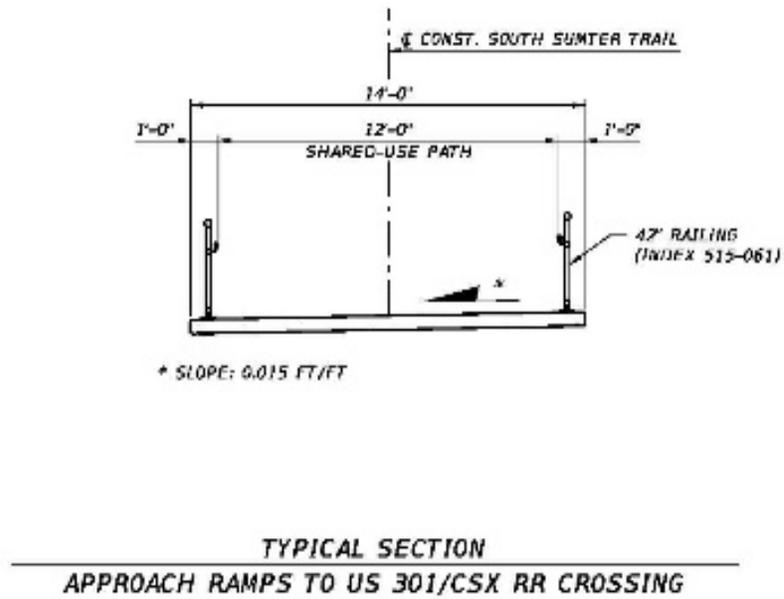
Typical Section – Approach Ramps to U.S. 301/CSX Railroad Crossing
